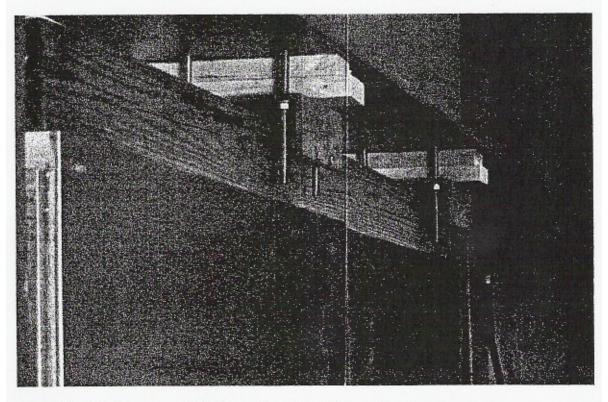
Response of 8' Galv.-Galv. Panel Under Racking Loading
